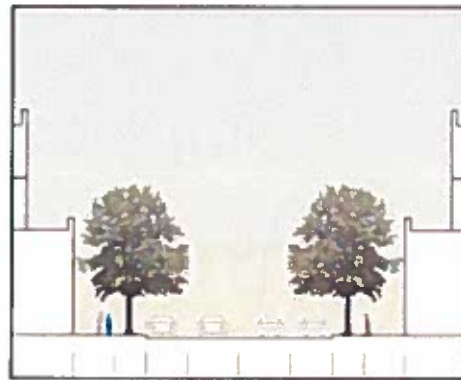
Residential streets provide two shared lanes for cars and bicycles, with two parking lanes, a floating strip and sidewalk.
